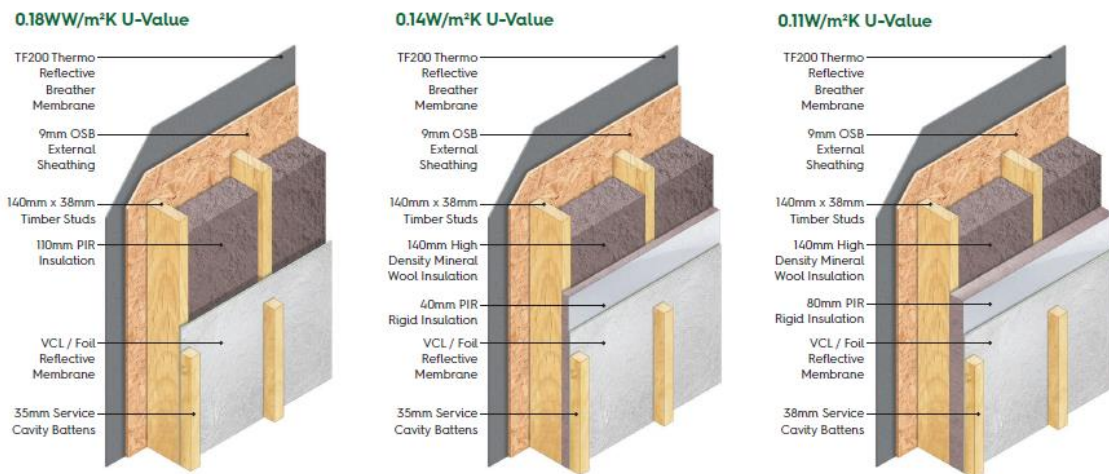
Execution Details of the Foundation for Timber Framed Construction For simulation (MBC Timber Frame UK Ltd, 2026)
